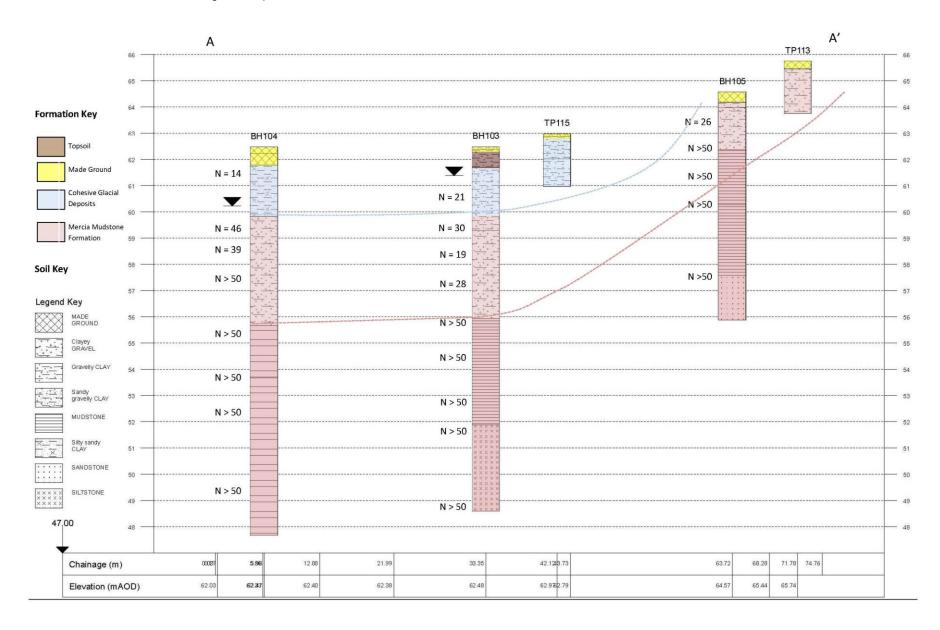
Cross Section. Vertical Scale 1:125, Horizontal Scale 1:404.
